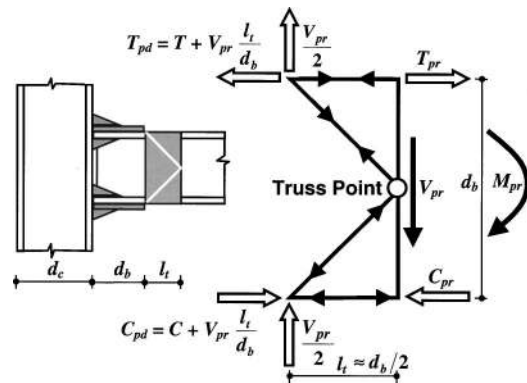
Beam-column subassemblage showing location and configuration of improved truss model, and flow of forces for design of beam-to-column connection elements
